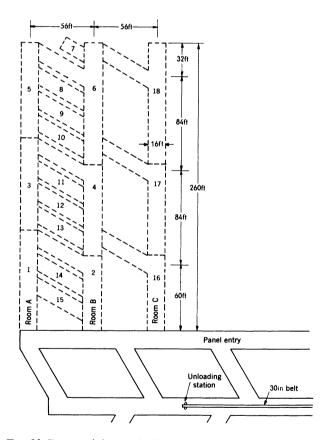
Room-mining and pillar extraction with a ripper-type continuous miner-shuttle car haulage to belt, Mine 10.⁽³⁾
